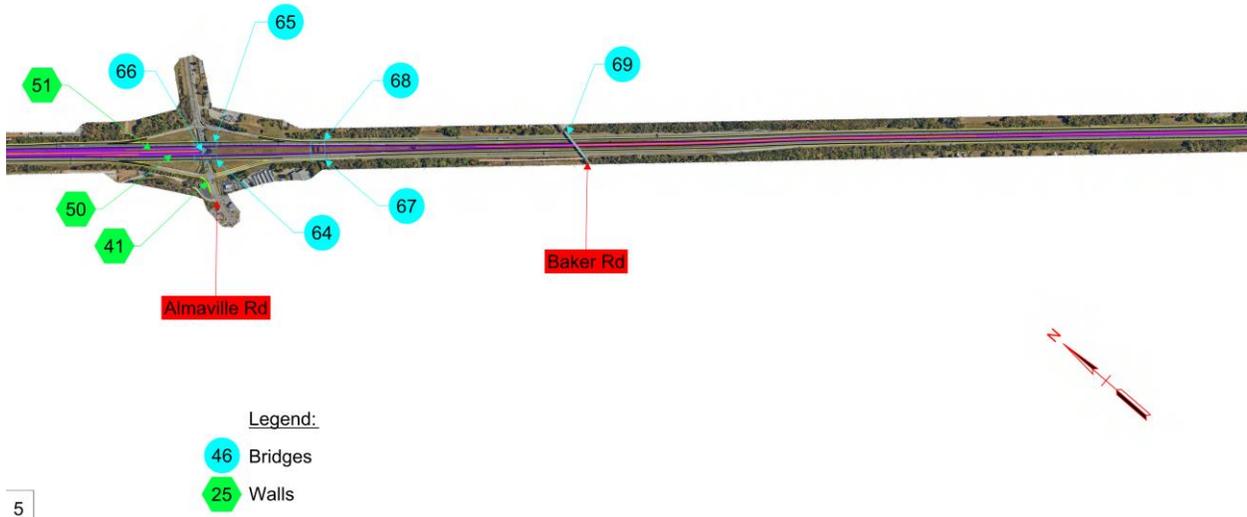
Alternative 2, Bridge and Retaining Wall Locations, SR 102 (Almaville Rd)
